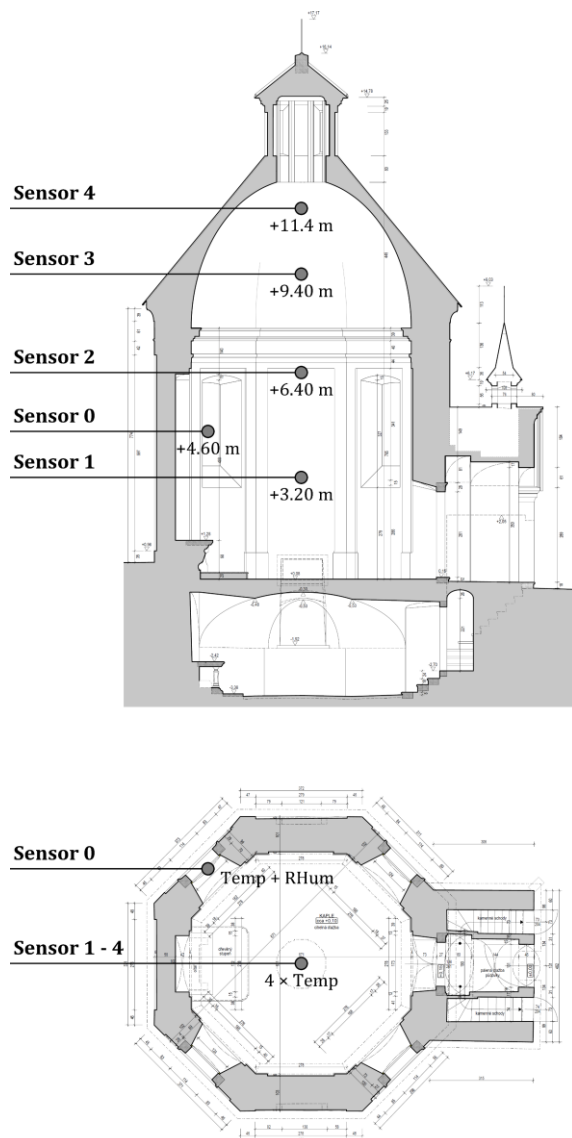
Floor plan and vertical cut of St. Borromeo chapel with the location of hygrothermal probes [3].
